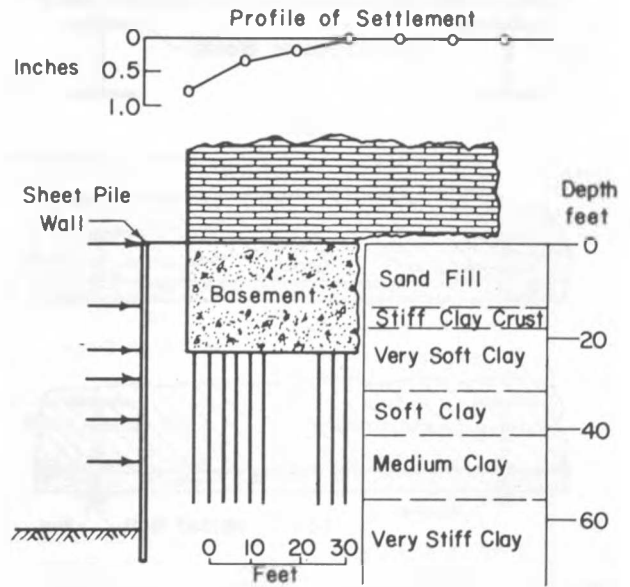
Section through Pile-Supported Rand McNally Building in Chicago, Showing Settlements Caused by Adjacent Deep Open Cut
